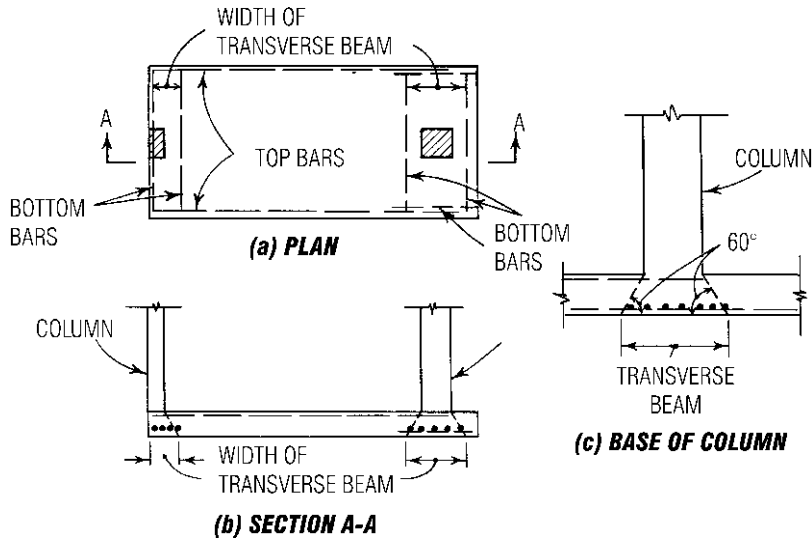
Combined footing. (a) Plan view. (b) Vertical section. (c) Detail at base of interior column.
